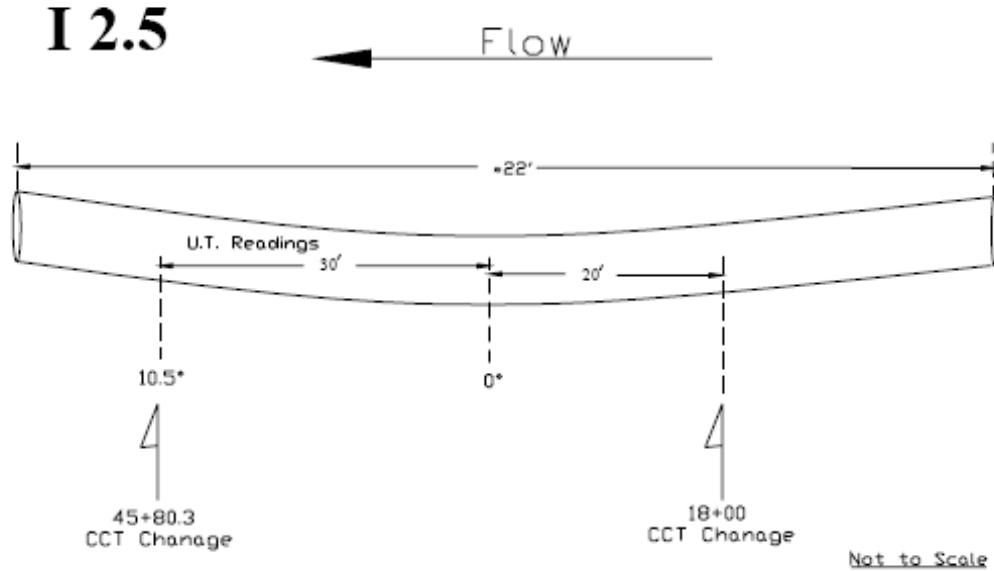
Schematic of Pipe Elevation at DG-ICDA Site 3
